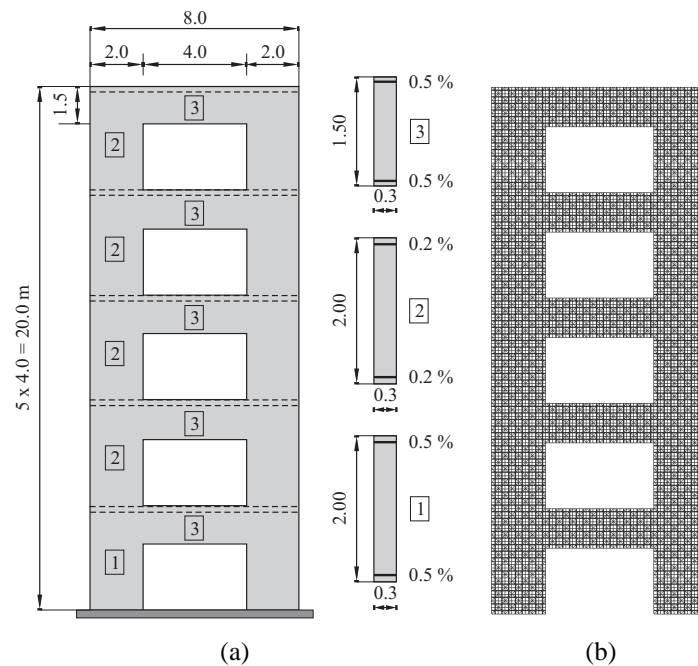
Coupled RC wall: (a) Geometry and reinforcement of the cross-sections, (b) Discretisation.
